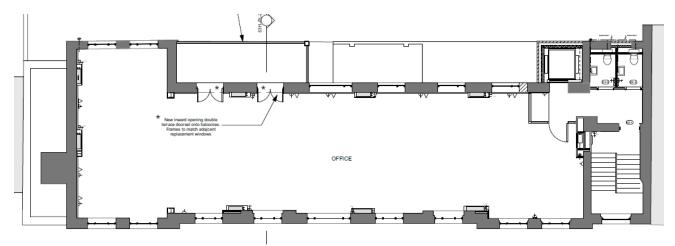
Proposed third floor plan showing proposed balcony. Balcony to be level with rear wing.
